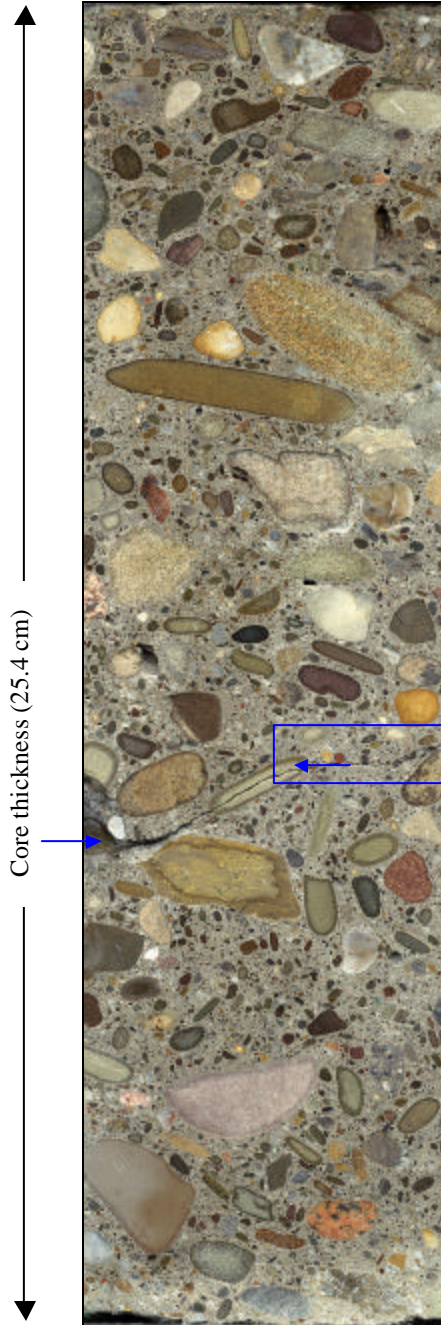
Polished cross-section of pavement section 39-3801.
